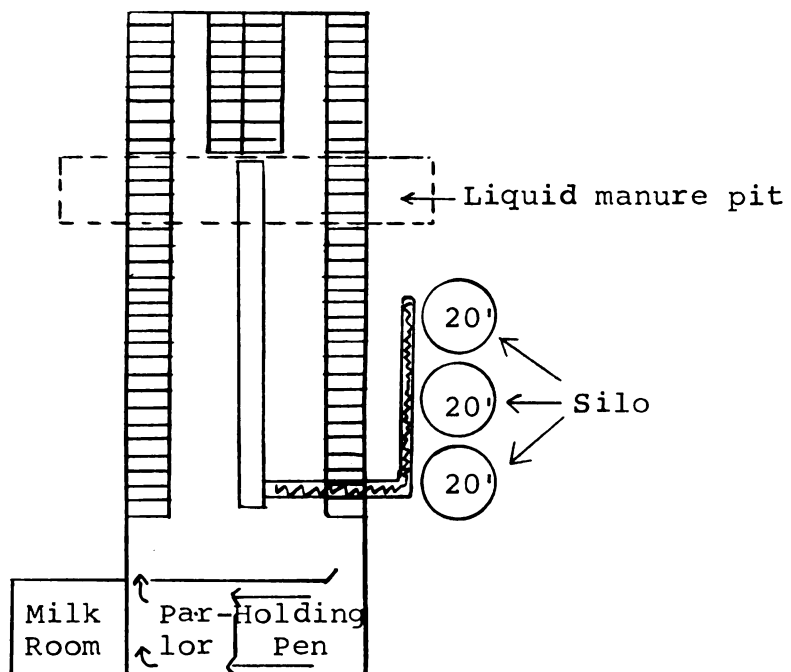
Eighty cow warm-enclosed free-stall barn. Similar plan to Figure 2, except here walls and ceiling are insulated and mechanical ventilation has been installed. Conditions in barn can be controlled regardless of outside conditions.
